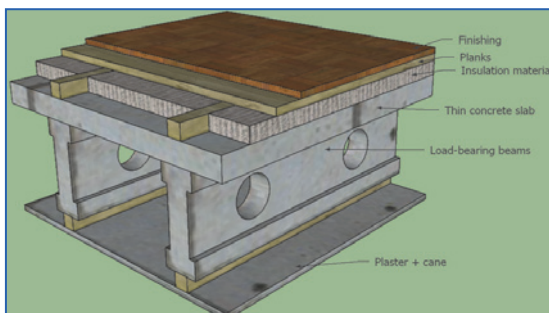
Floor construction used in buildings built in the 1950s and 1960s.
